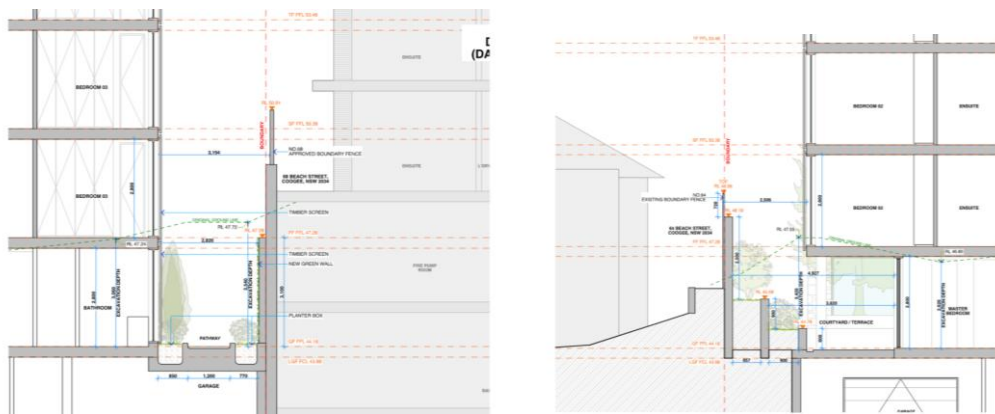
Detail sections – southern (left) and northern (right) wall (Source: Roth Architects)
